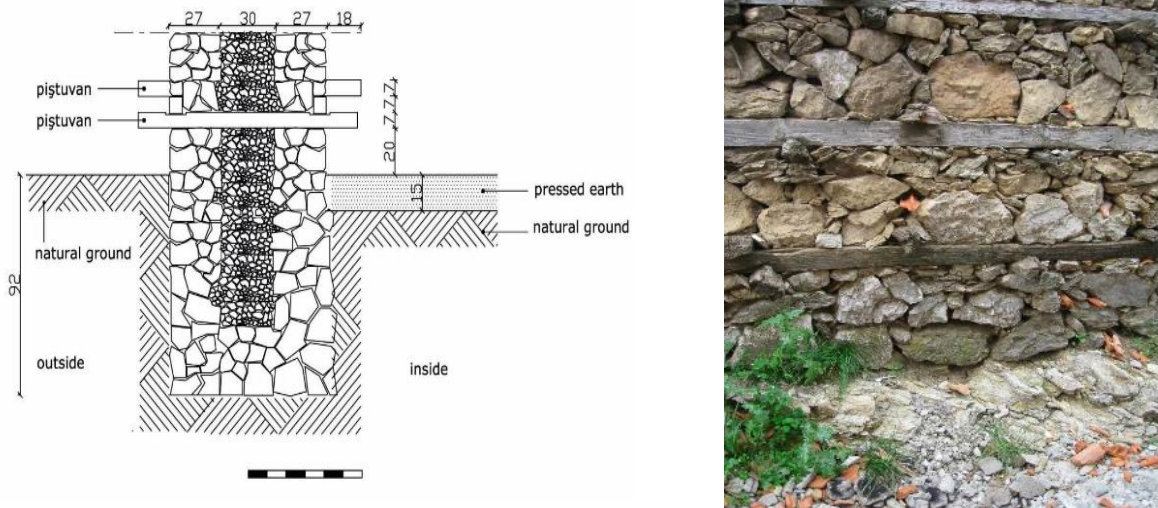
Detailed Section of Foundation (Type- B)(Çelik, 2009).
